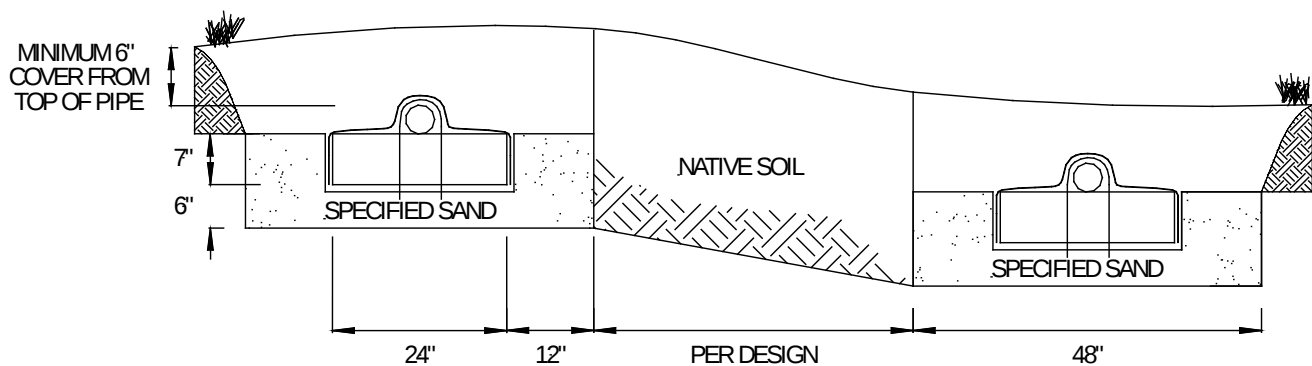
SECTION VIEW – 600 GPD – TRENCH SYSTEM – SLOPING SITE
